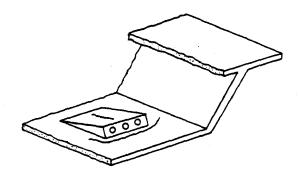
Box Girder Cracks Induced by Concentrated Loads
